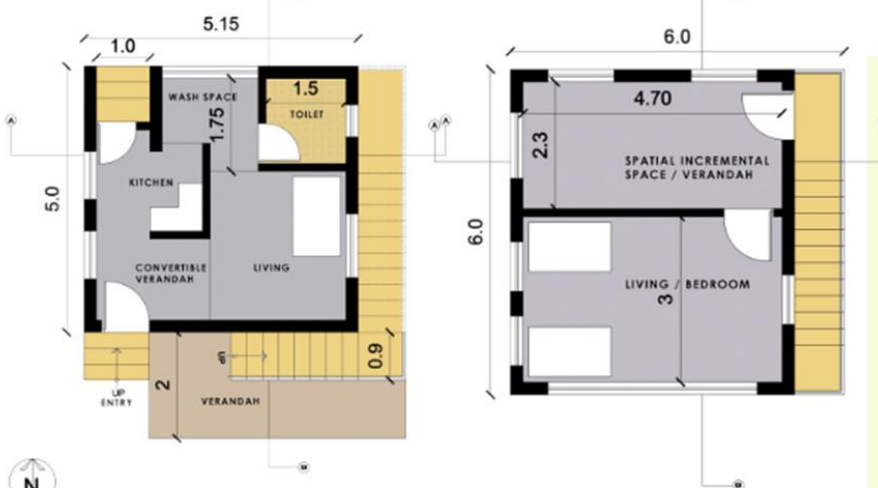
GROUND FLOOR AND FIRST FLOOR PLANS
